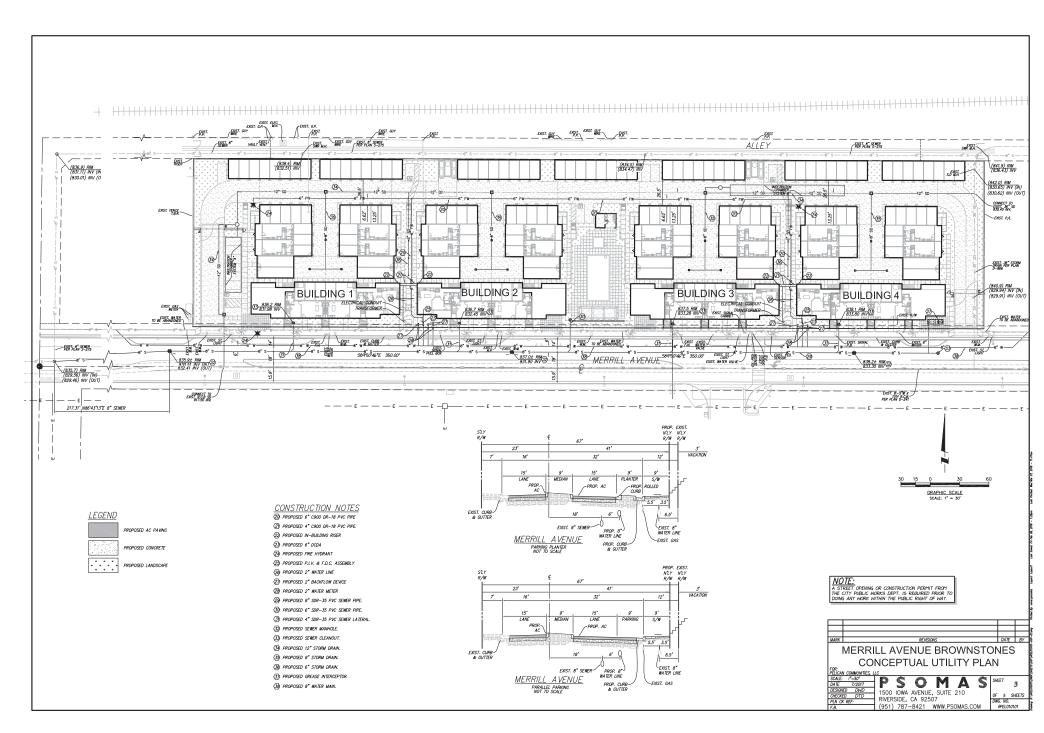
Project Plans (Conceptual Utility Plan)
